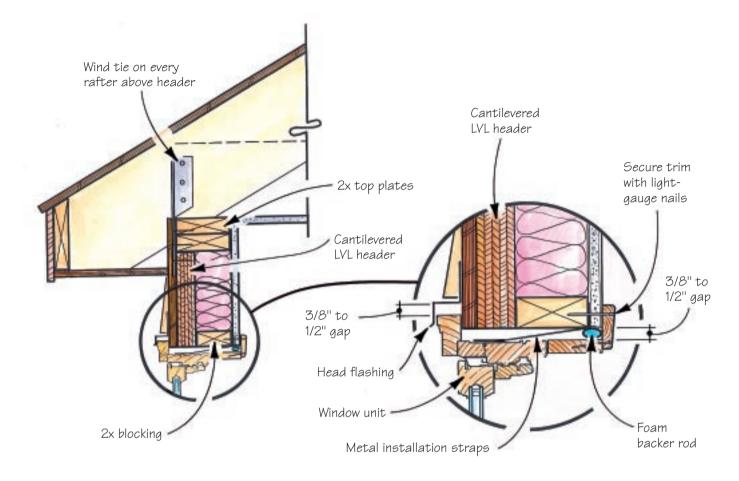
To ensure that the header load never transfers to the top of the corner window frame, use foam backer rod as an infiltration gasket, and avoid nailing directly through the window frame into the header. Metal installation clips are available upon request from window makers.
